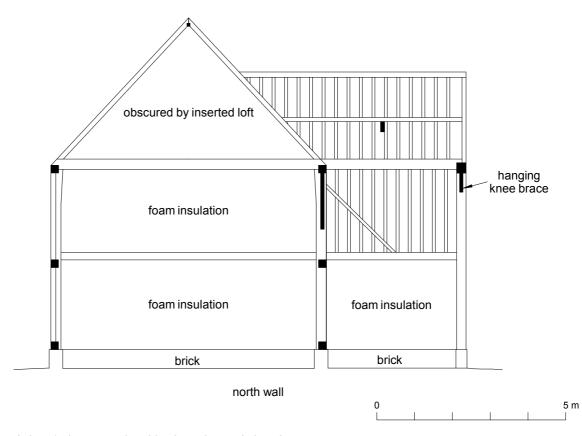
Building A, late 17th-century threshing barn: internal elevations.
